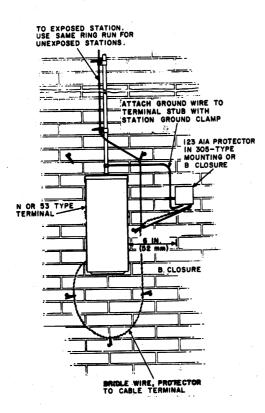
PN- or 53-Type Terminal, Wall Installation
